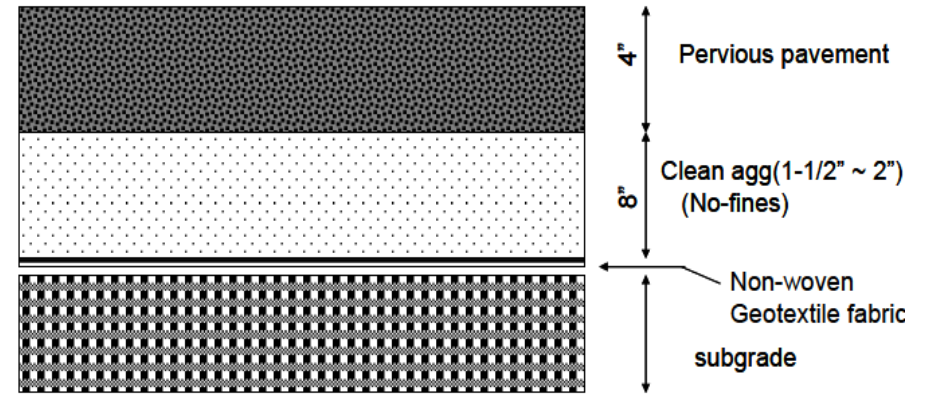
Pervious Concrete Pavement Design for Sidewalk, Cart Path, Hike, and Bike Trails, after (www.stonecreekmaterials.com)
